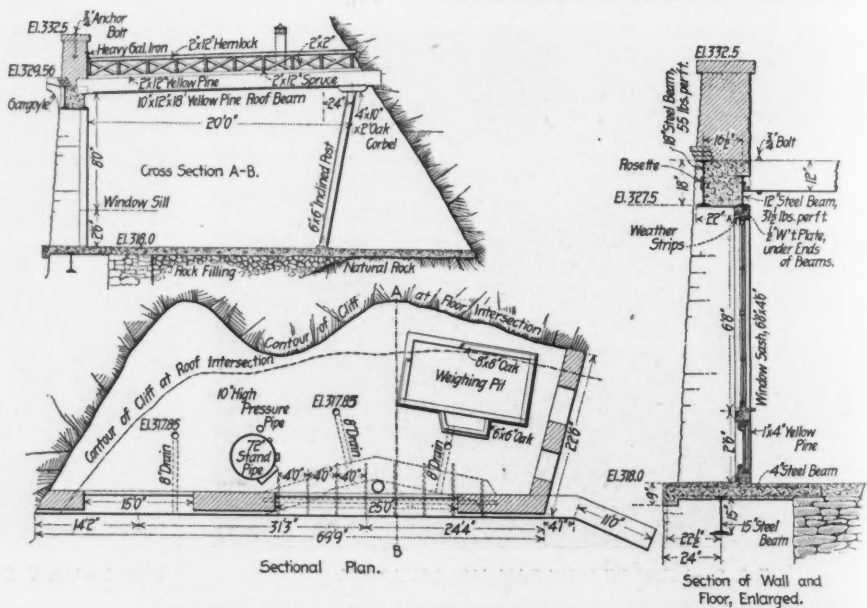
PLAN AND SECTION OF LABORATORY BUILDING.
